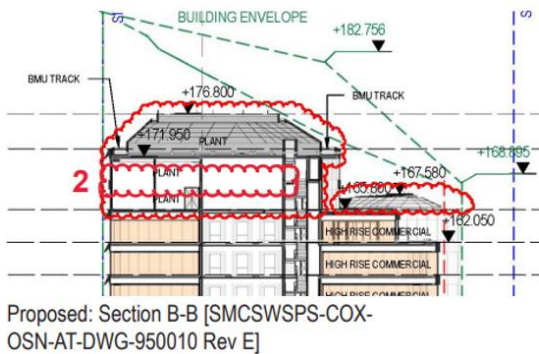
| Changes to roof plant rooms (Source: Modification Report)
